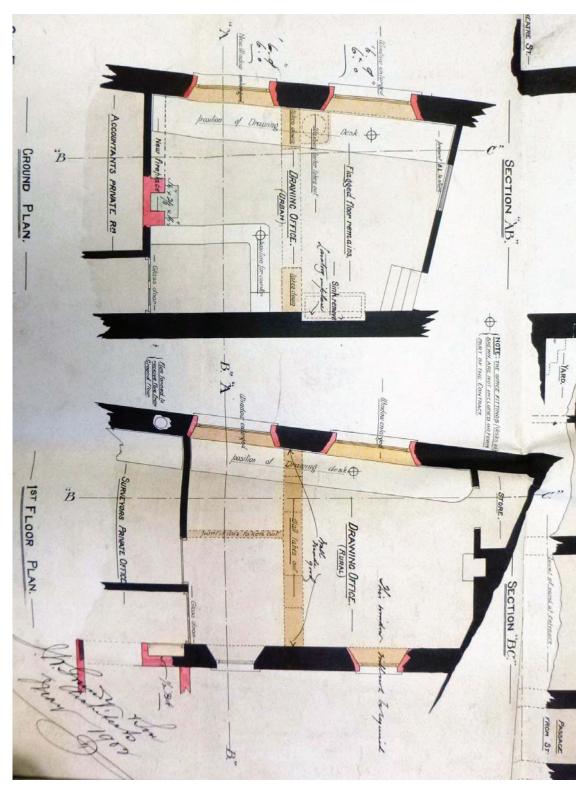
Ground (G10) and first floor plans (F12) of the drawing offices for the surveyors, dated 1902 (CAC(B) Z/1028/2 1901-1904)
